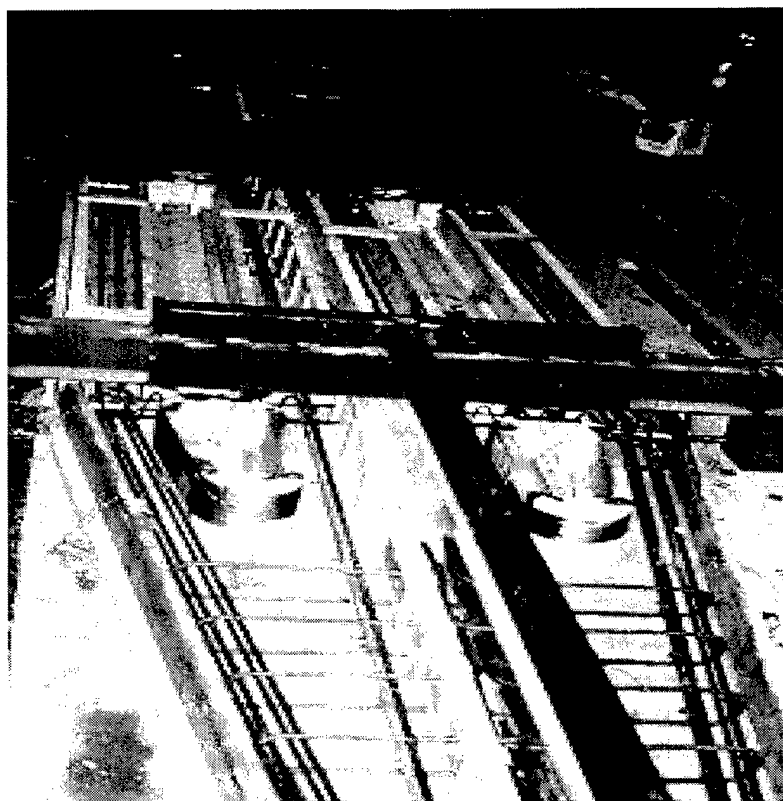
Formwork and prestressing tendons for hybrid joist web.
